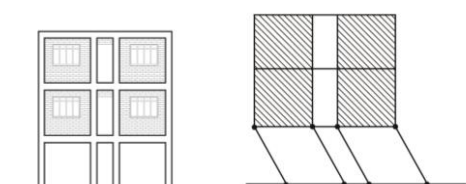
Soft story, no infill walls on ground floor for commercial functions (Shock Safe Nepal group 1).
